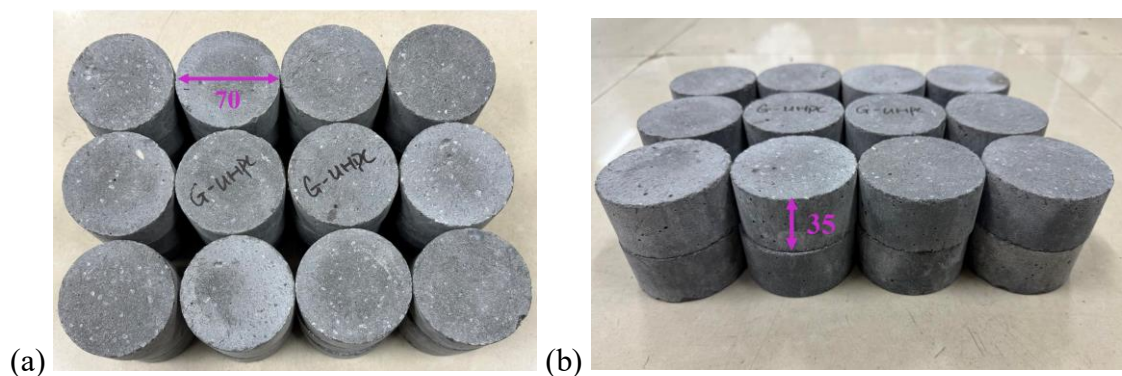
1 GUHPC specimens for testing (unit: mm).
